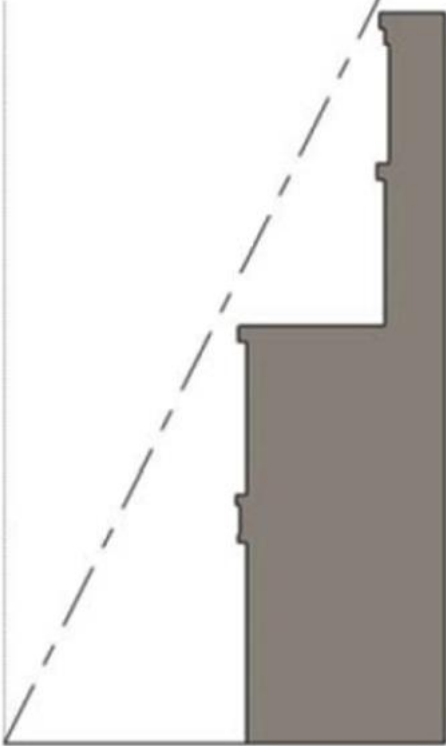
A: Upper floors must be set back from lower level building façade to ensure that taller buildings still present a comfortable and compatible scale to pedestrians
